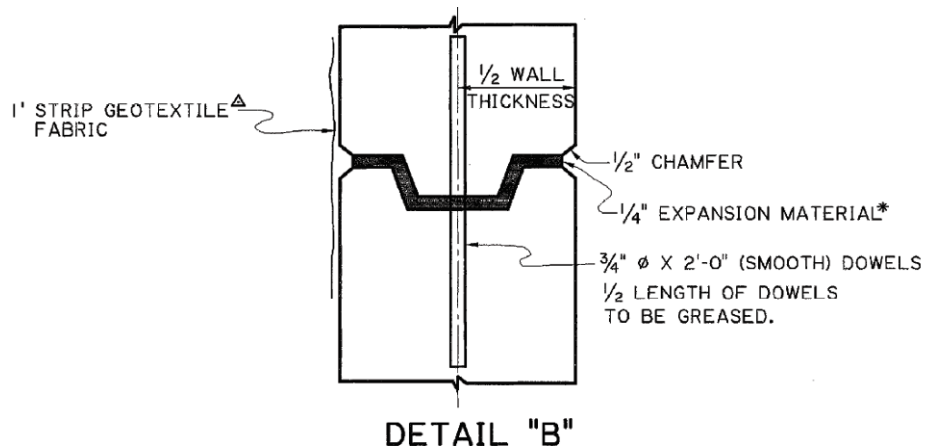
La DOTD Wingwall Expansion Joint Detail (La DOTD 2008)
